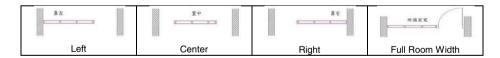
Construction Location Type of Two-sided Partition Wall (Plan Sketch)
